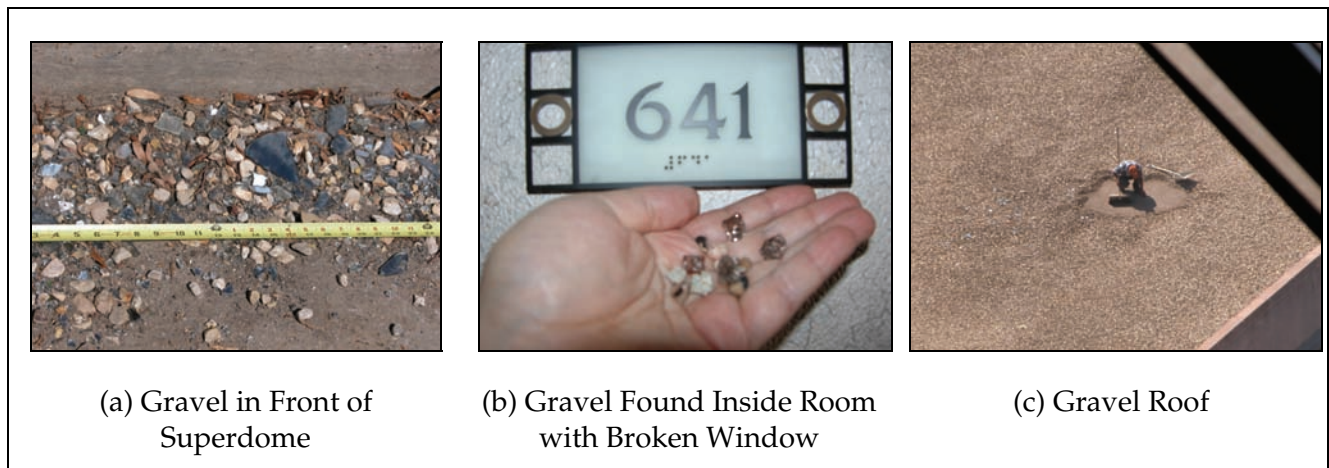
Gravel found on adjacent street curbs and inside substantially damaged buildings in New Orleans (a/b). Source of gravel was likely roofs from building upwind of damaged windows(c).
